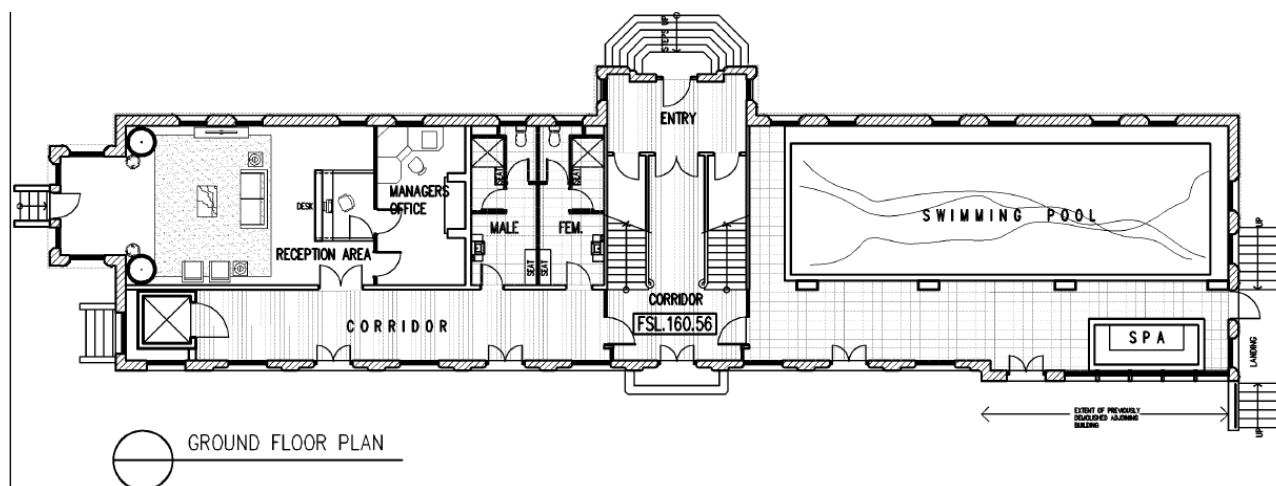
Approved ground floor plan of the Monastery building providing some of the community facilities.
